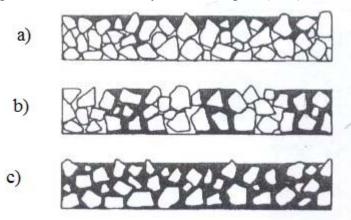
Grouted stone: a) Surface grouting b) Pattern grouting c) Full grouting
